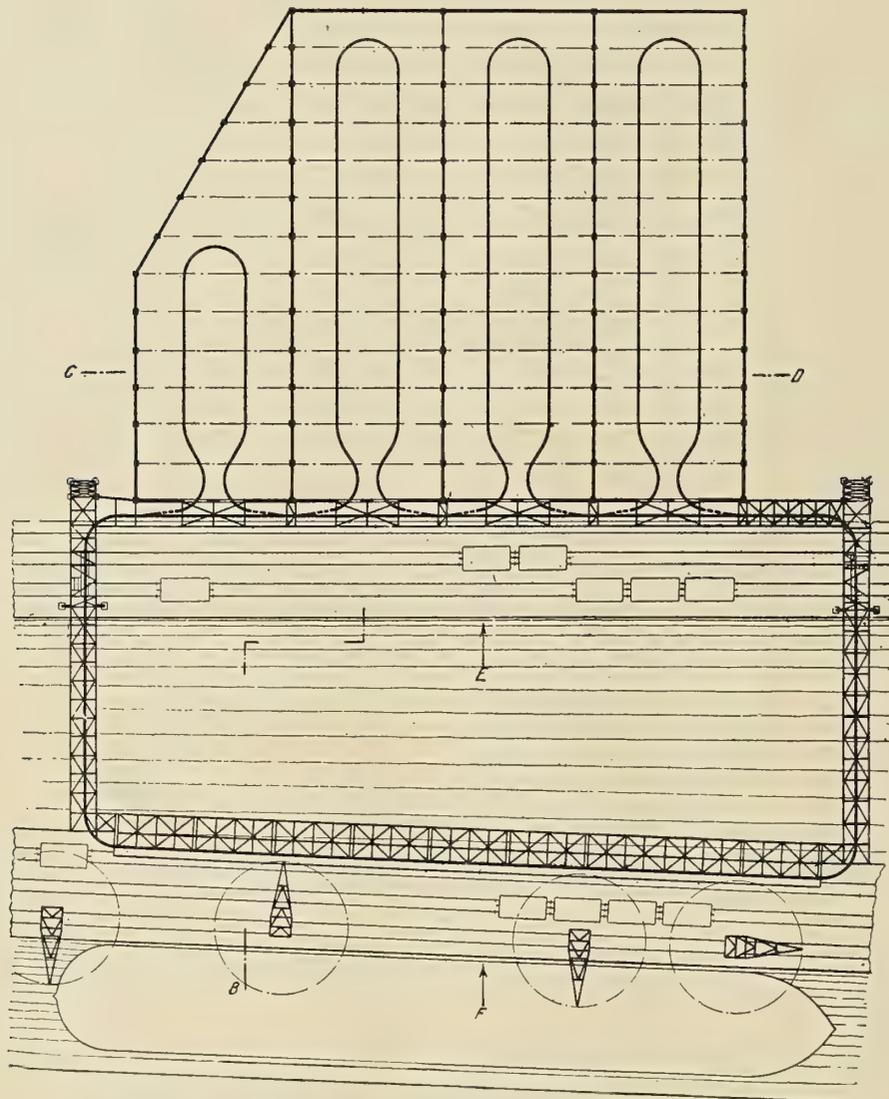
PLAN OF PIER AND STOREHOUSES, SHOWING ARRANGEMENT OF CONVEYORS
